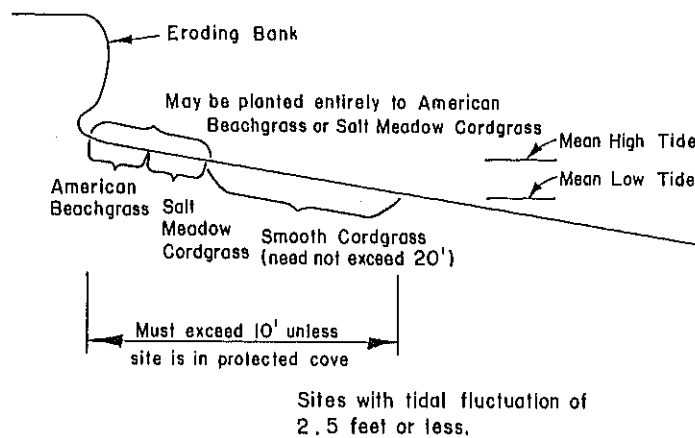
Recommended planting arrangement when tidal fluctuations is less than 2.5 feet
